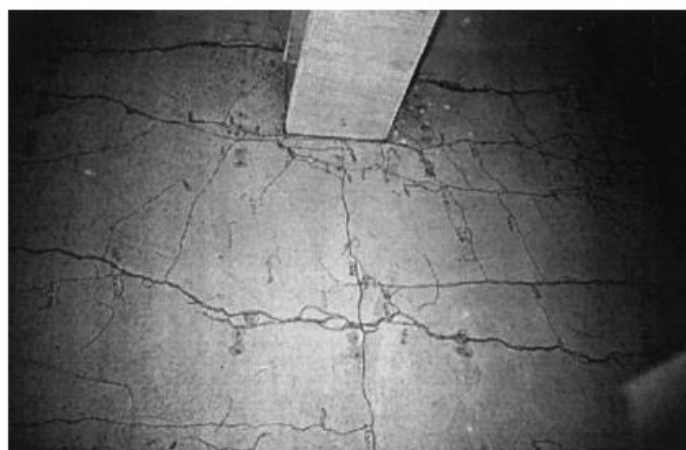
Crack Pattern at Column Face (Civjan et al. [11])
